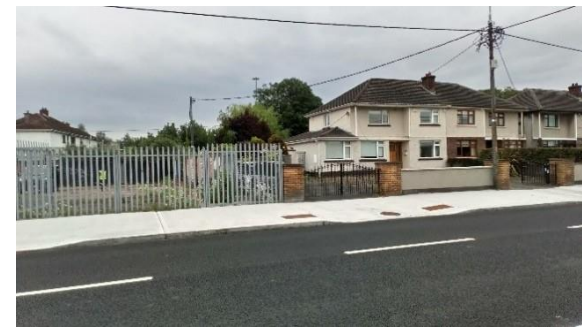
Site from Old Lucan Road with neighbouring houses
